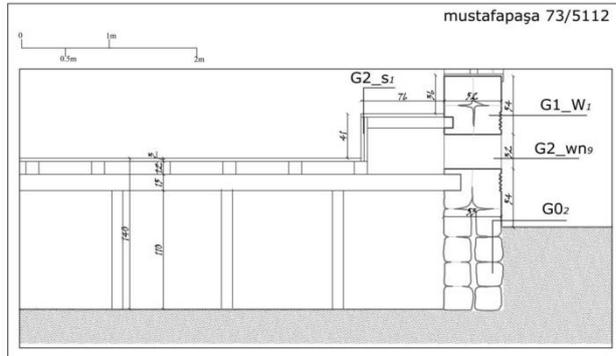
, Elevated timber floor and *sedir* (Mustafapaşa, block/lot: 73/5112-1)
